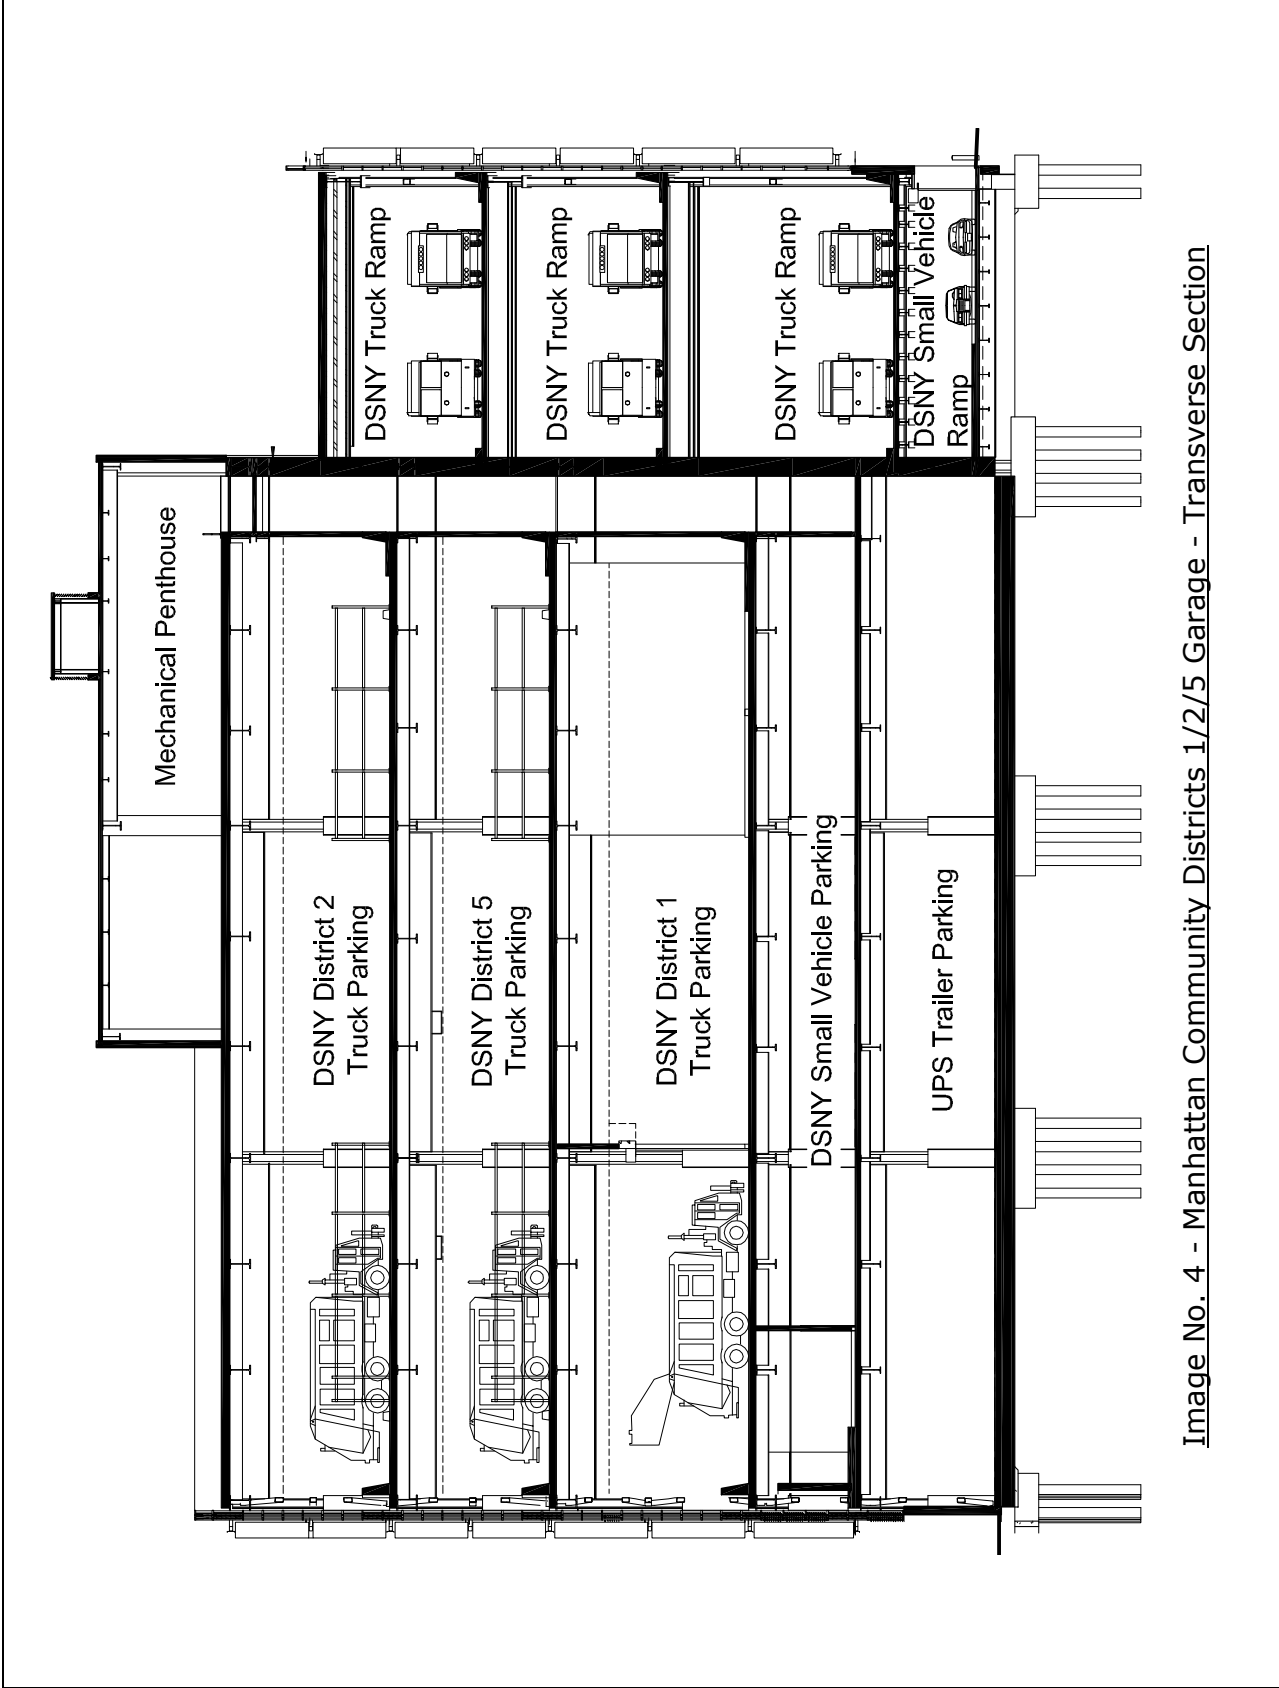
Manhattan Community Districts 1/2/5 Garage - Transverse Section
